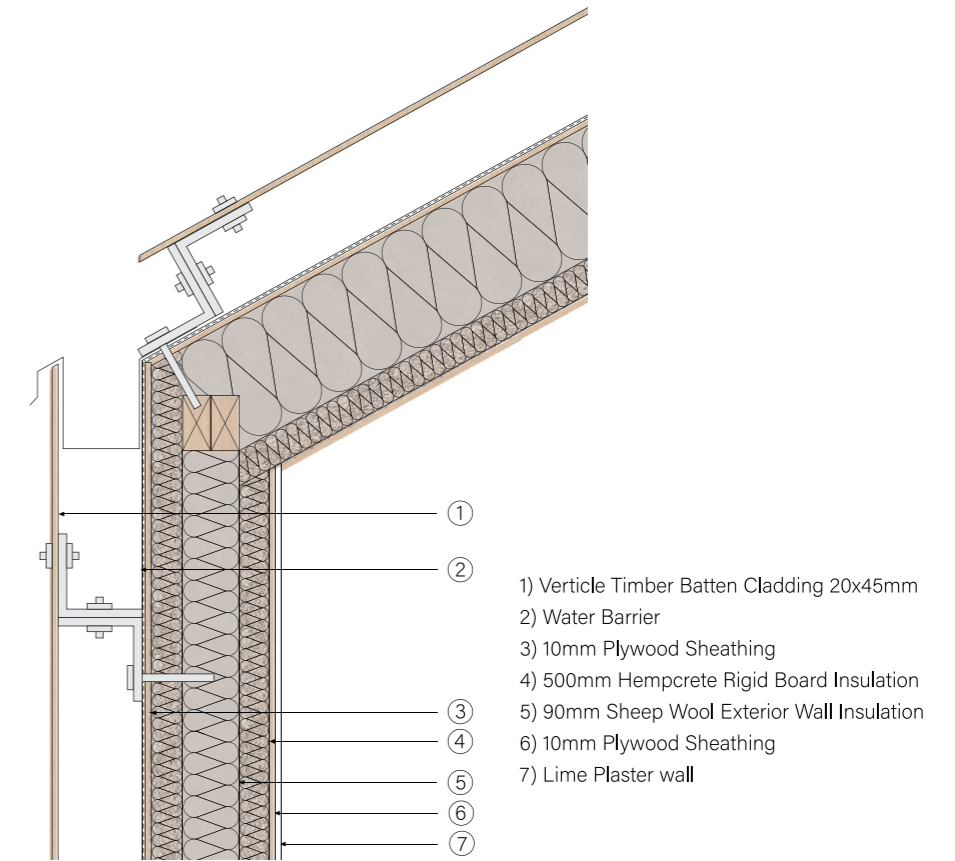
Timber Roof Detail Drawing Version Two (Scale 1:200)
